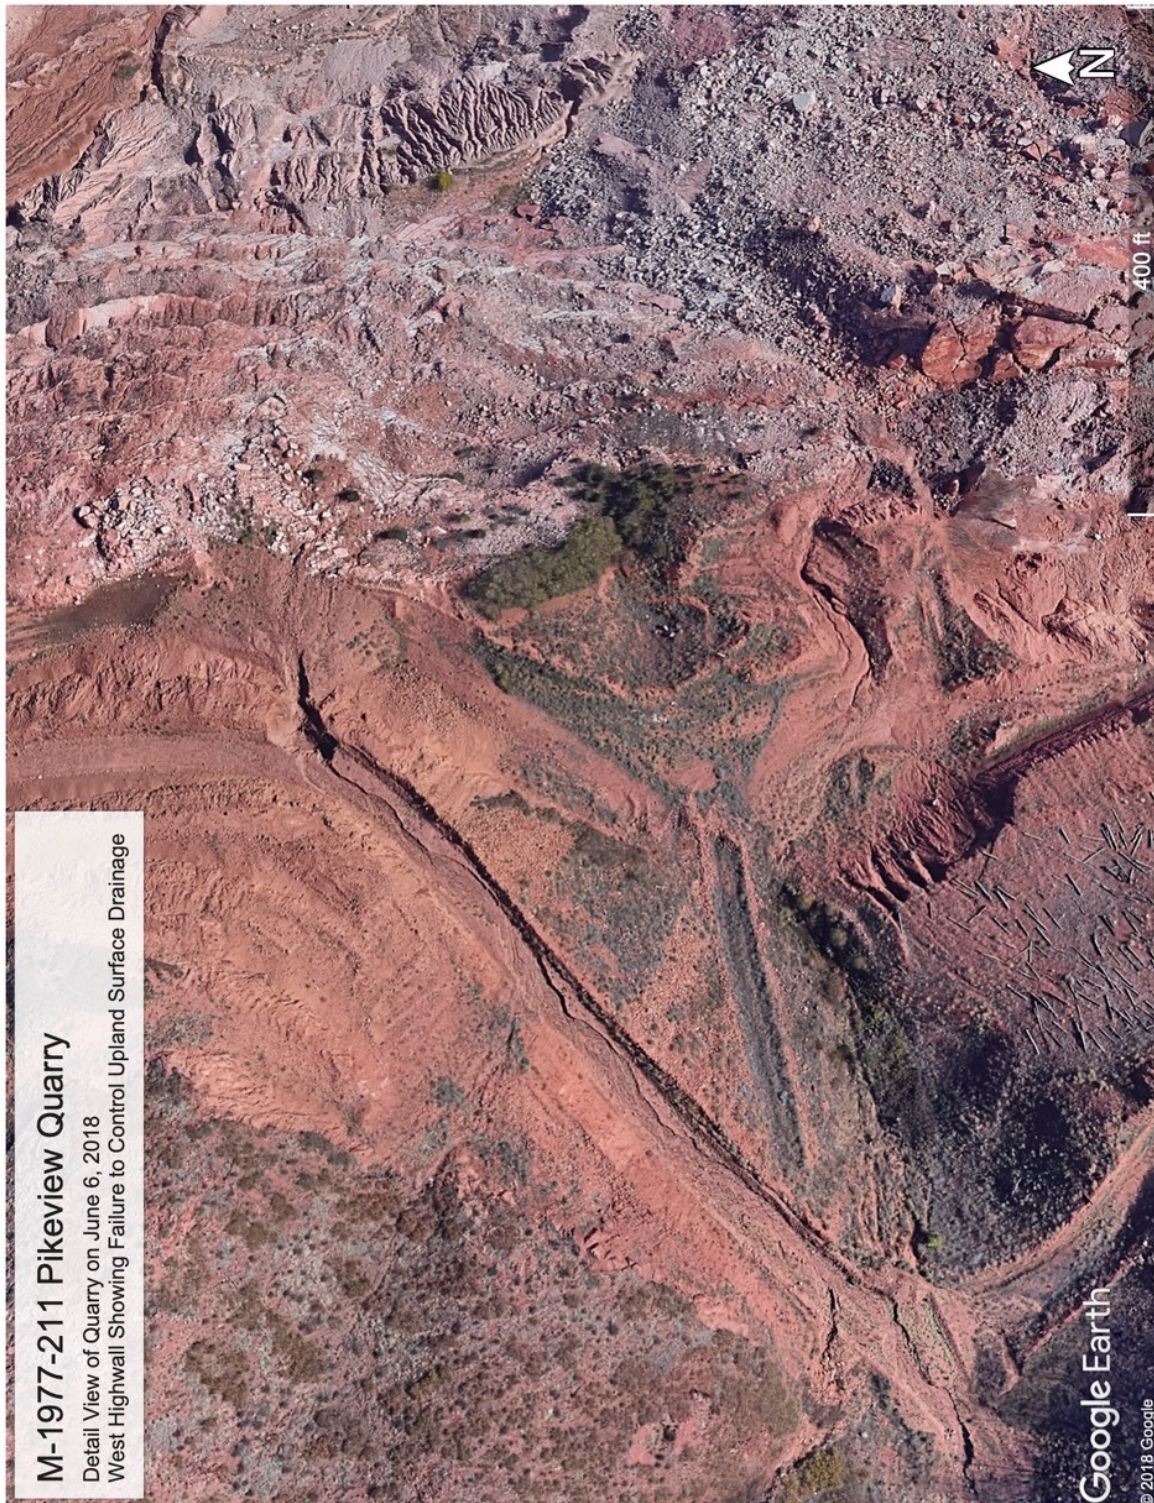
Detail of West Highwall showing breaches in the informal upland surface water control structure.
